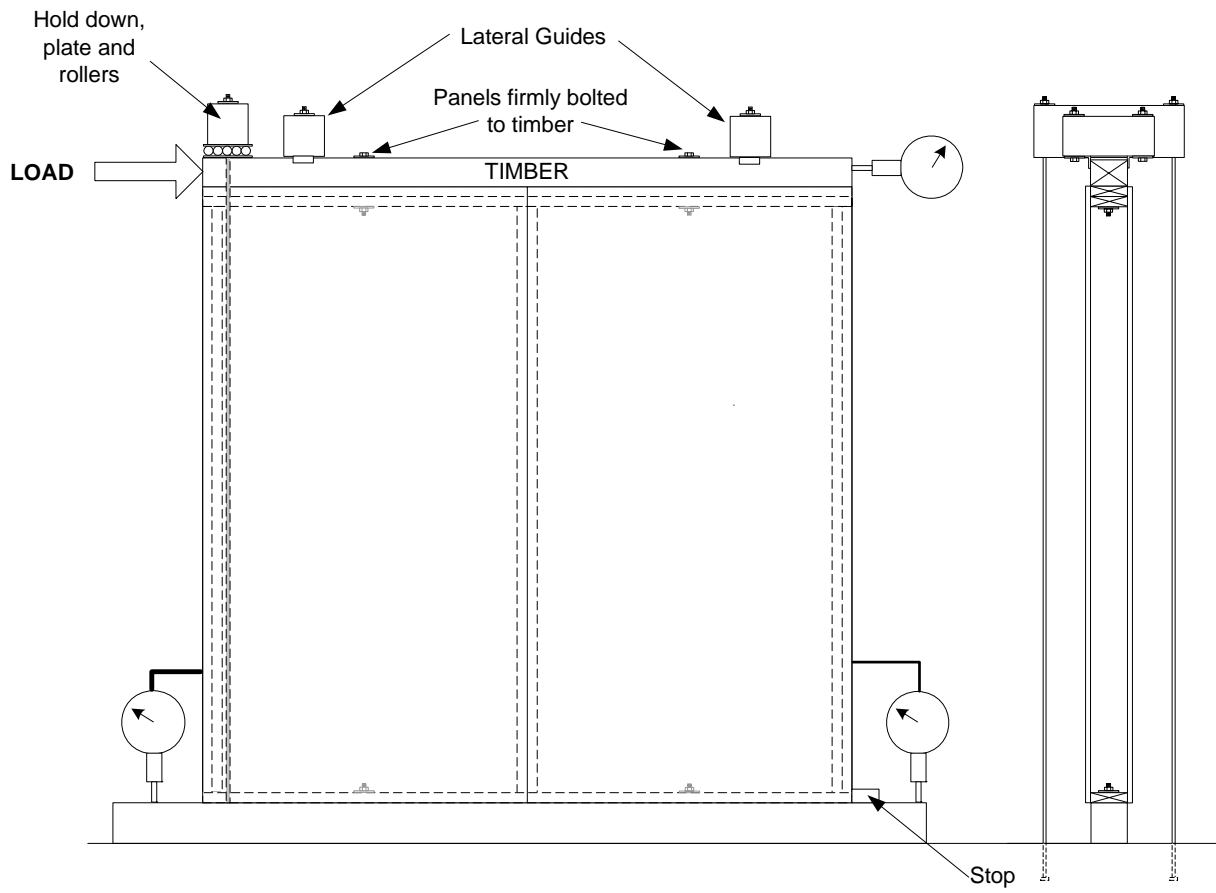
RACKING SHEAR TEST ASSEMBLY
